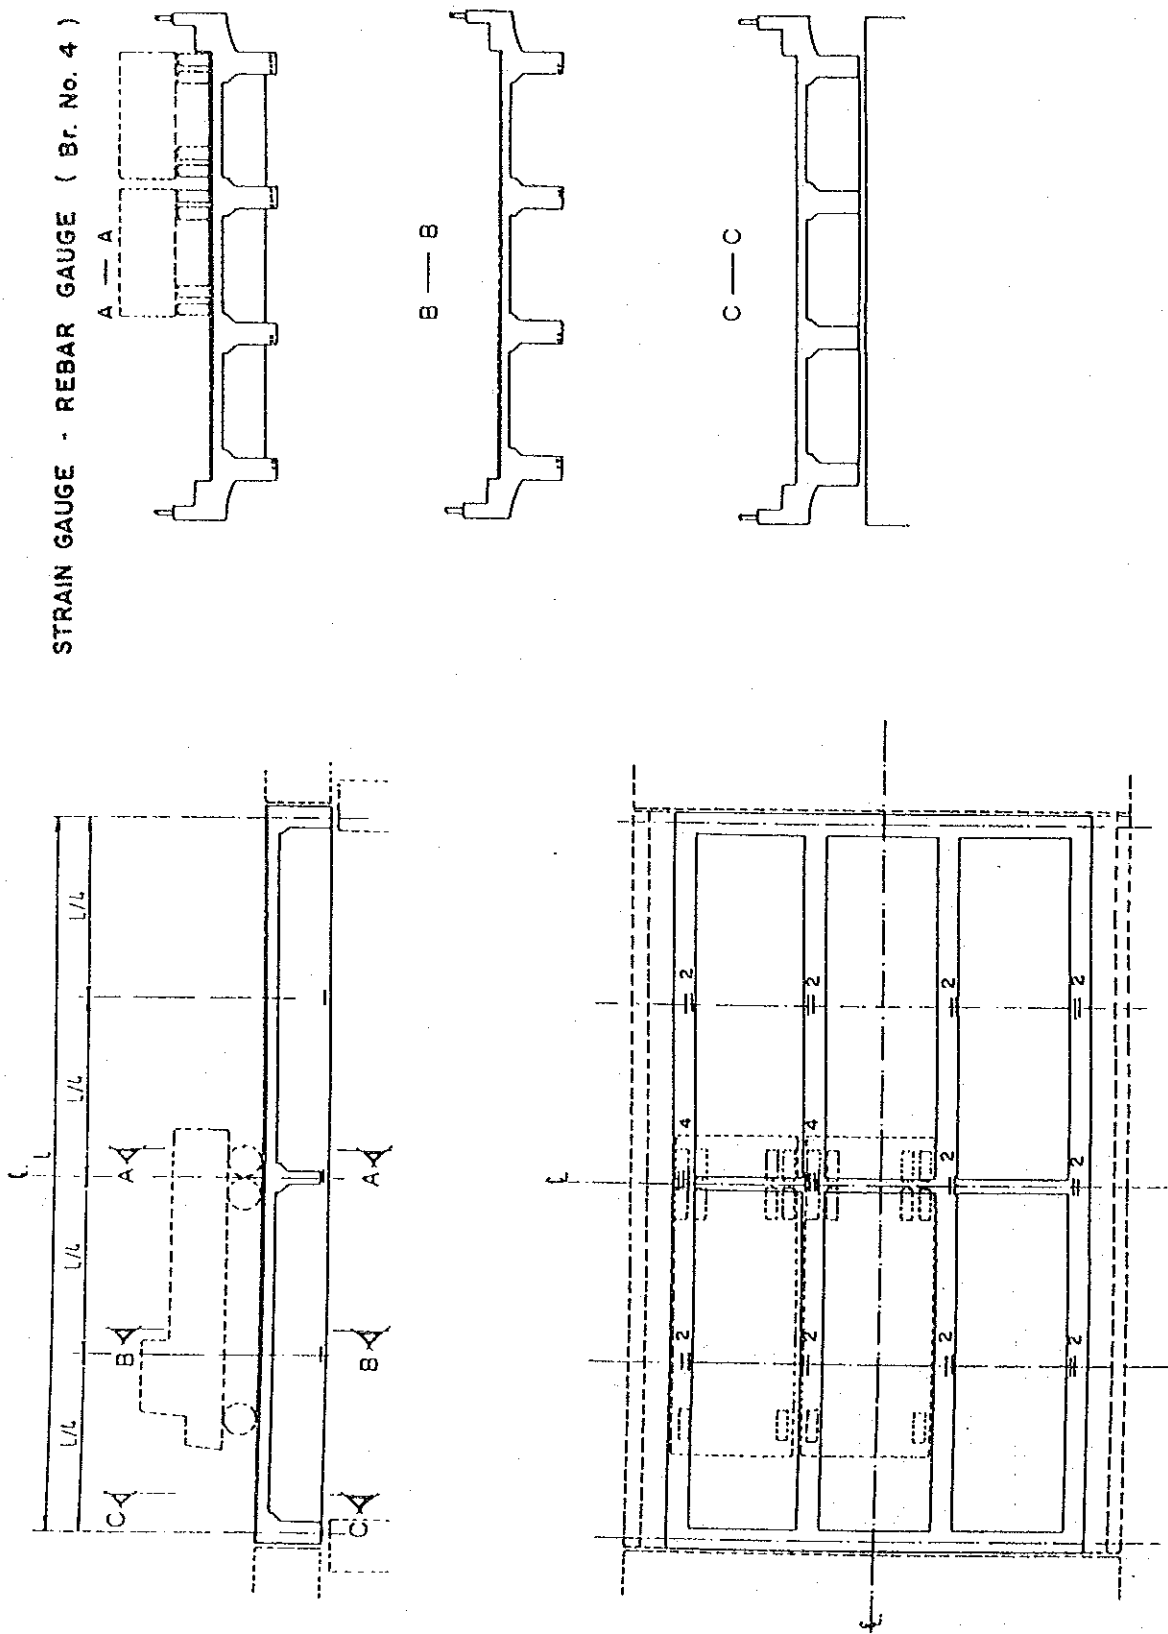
Setting Position of Measurement Equipment (Br.No.4)
